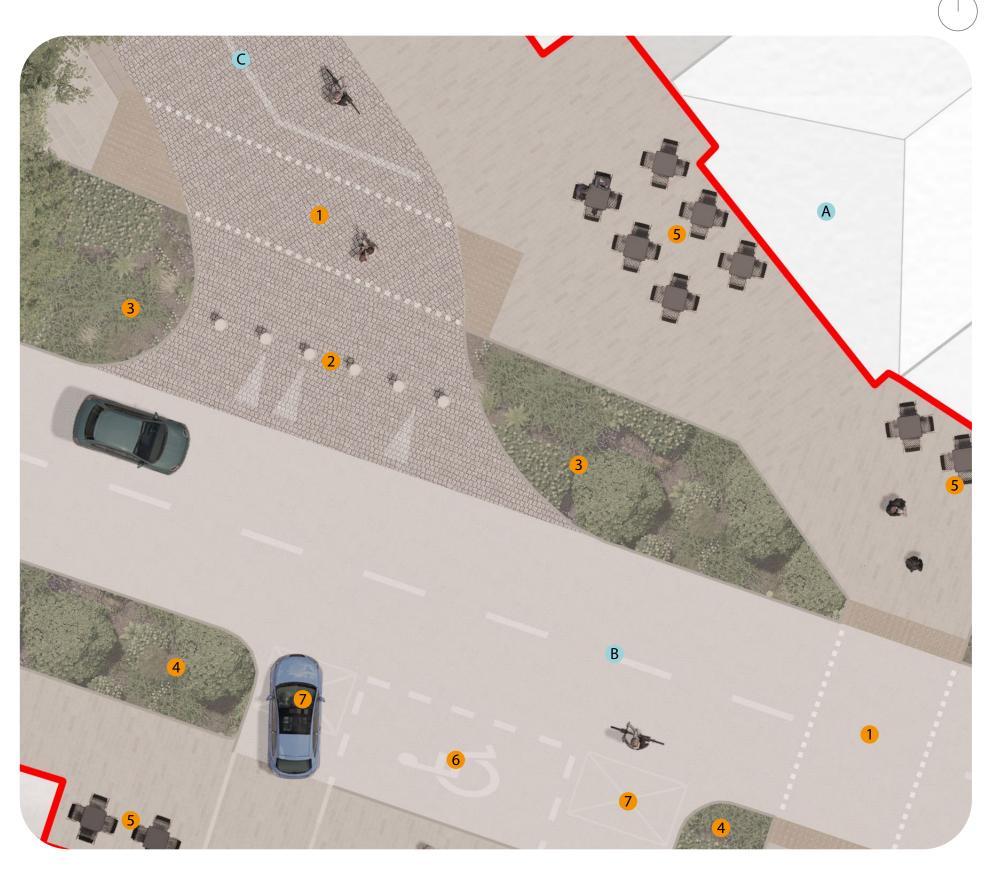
; Proposed Pedestrian Crossing and Bollards - Market Square East / Dublin Street
